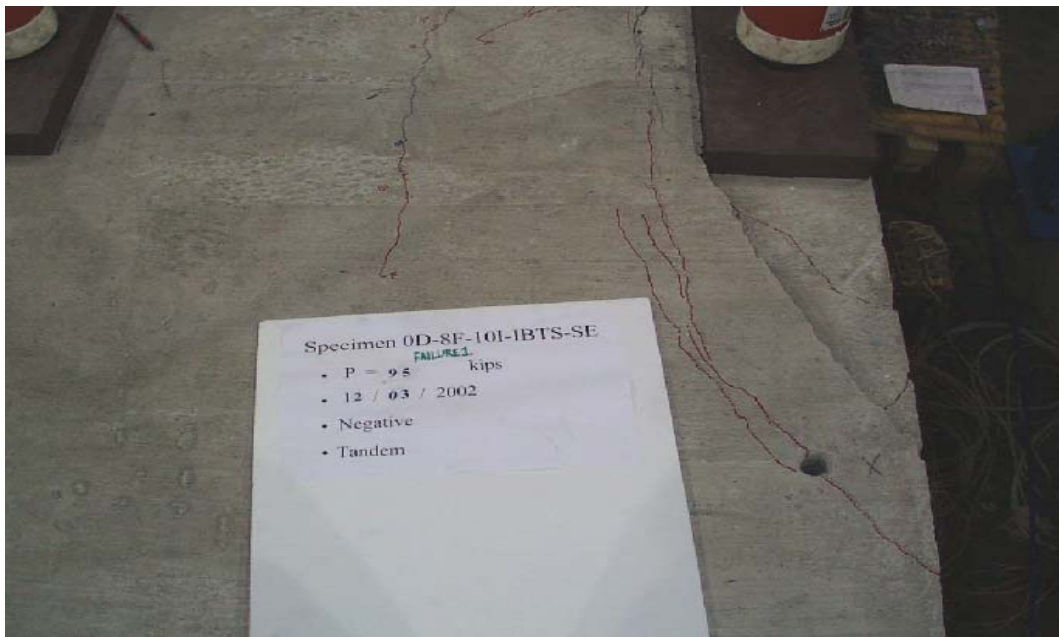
Interior span failure at side of deck, interior span, facing north
